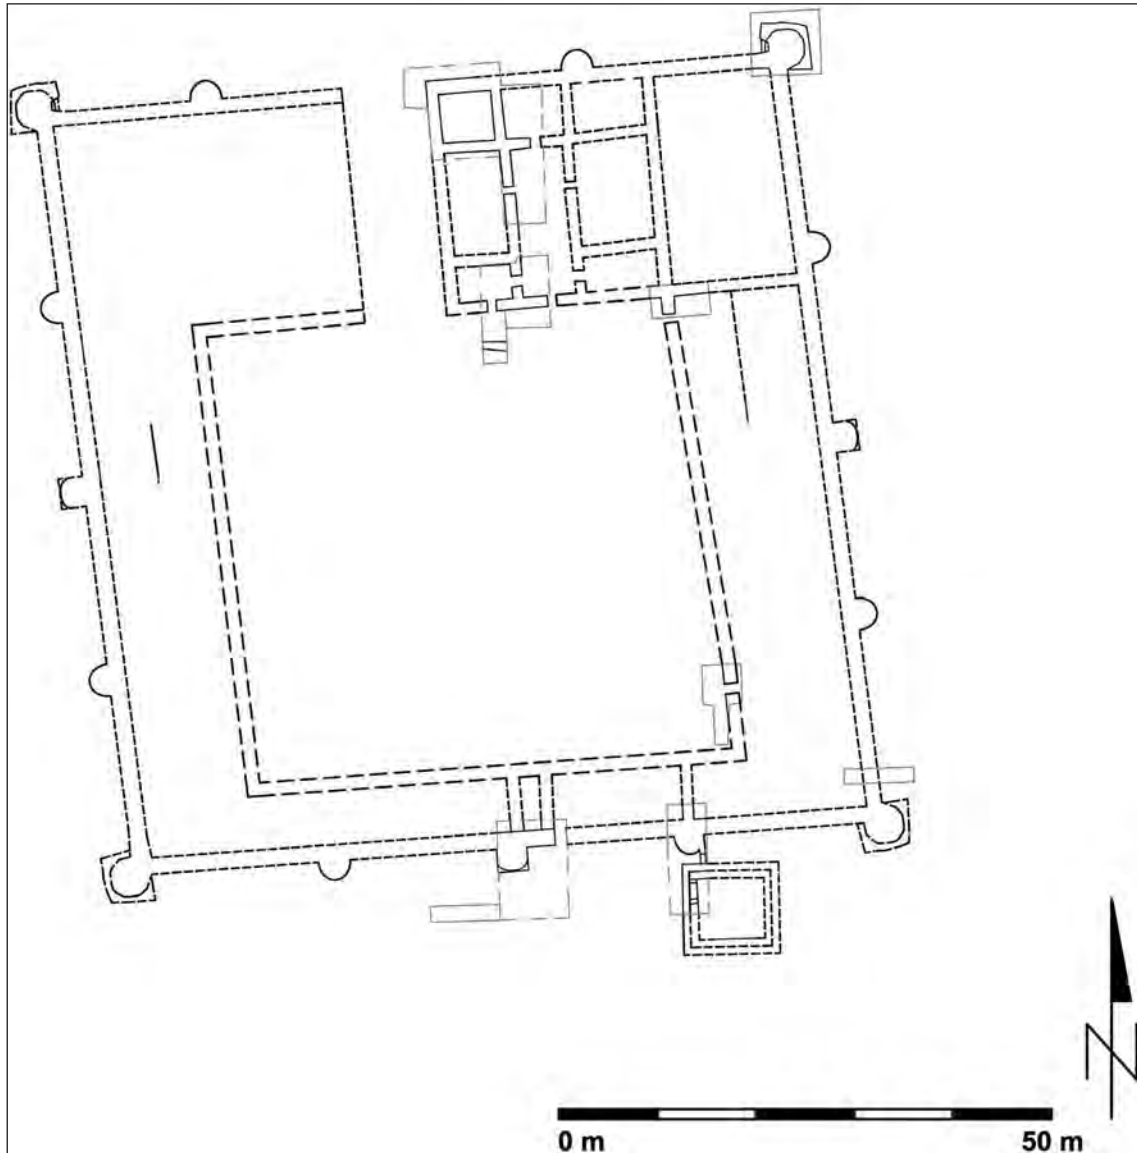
Resafa, FP 220, preliminary partial reconstruction of the ground plan after the first two excavation campaigns in 2007 (Ch. Konrad 2007).
